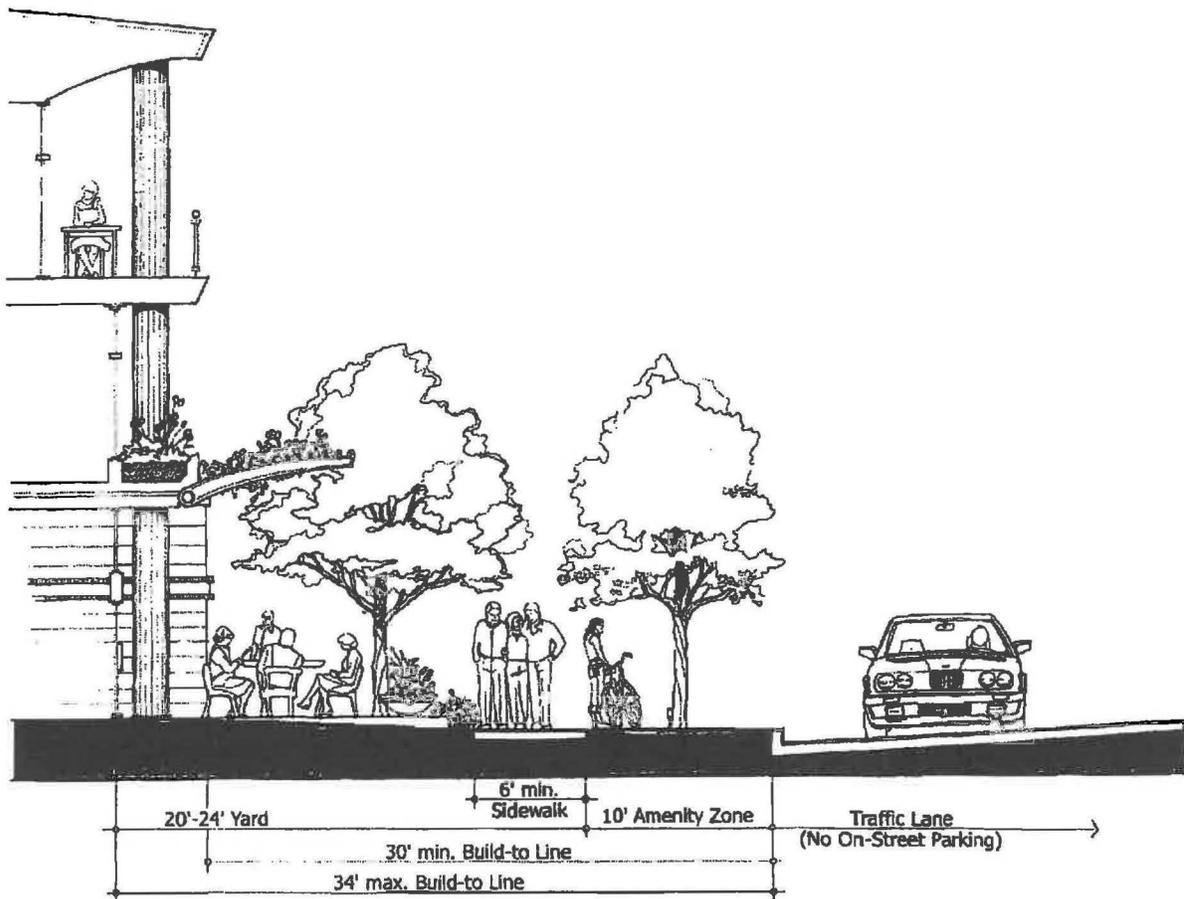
Street section, arterial streets and Greenville Avenue
